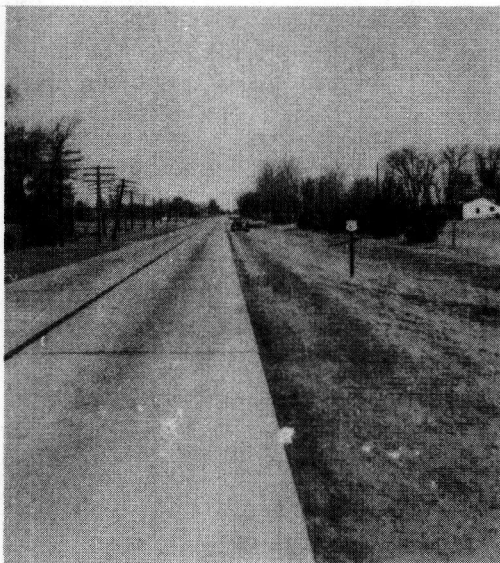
Same pavement as pictured in Figure 8. Pavement rode well in 1954, appeared to be in good condition; in some places, new cracks formed 10 to 15 feet back from older cracks.
